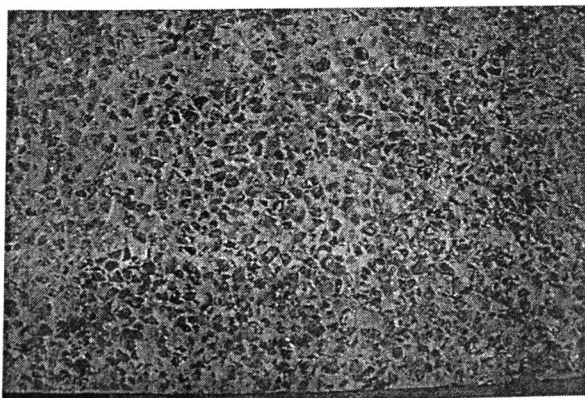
Concrete slab impregnated with 20 mm angular stones
